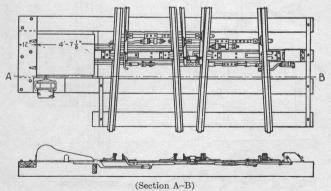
Double SLIP Switch Operated by Model 2 Switch Machine
